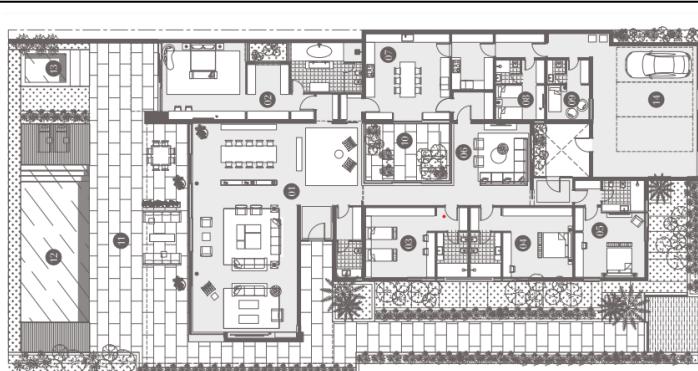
ground floor plan FOUR-BEDROOM SIMPLEX VILLAS
